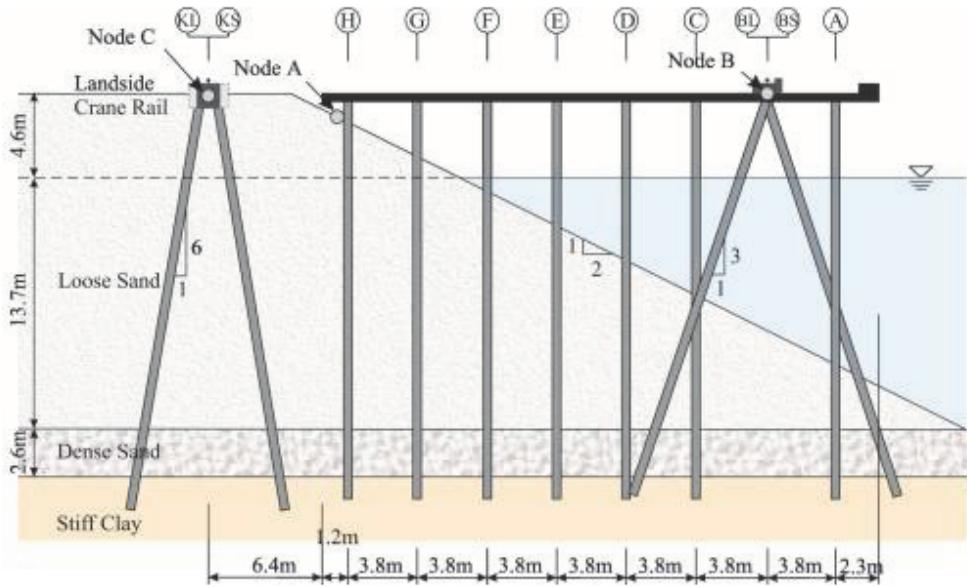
Schematic cross section of example pile-supported wharf configuration (Shafieezadeh et. al., 2011a).
